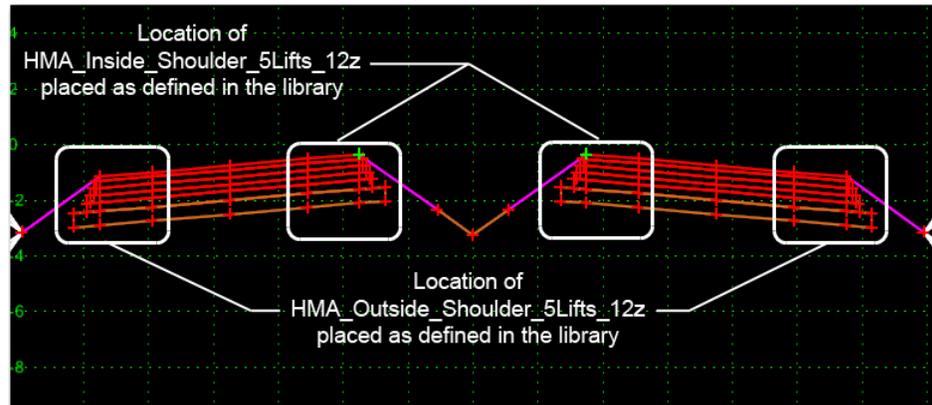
C/G\_Type2-IIB Pavement Greater Than 4%
